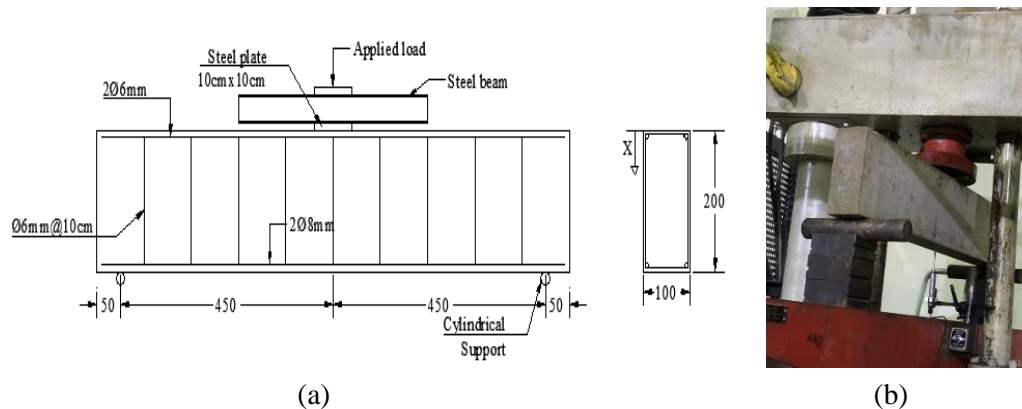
Three point bending test: (a) beam dimensions and reinforcement, (b) test machine.
